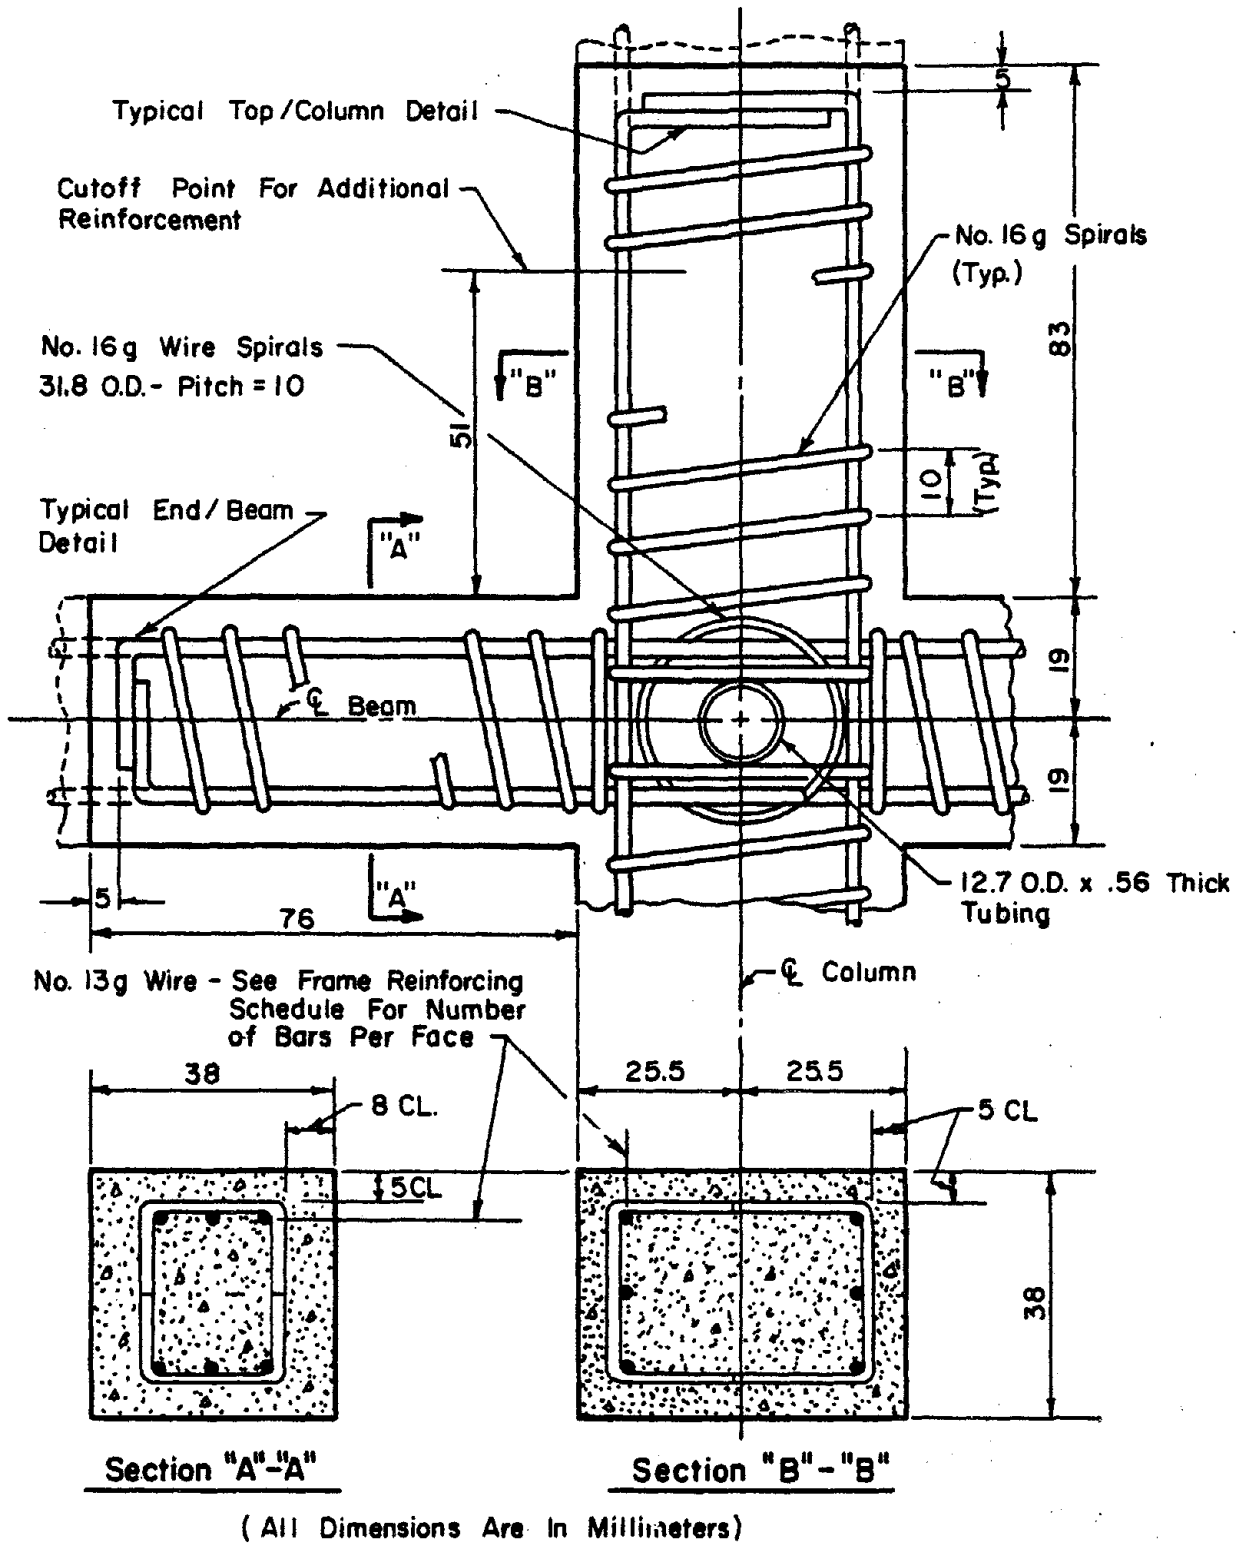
REINFORCEMENT DETAILS OF STRUCTURAL COMPONENTS
